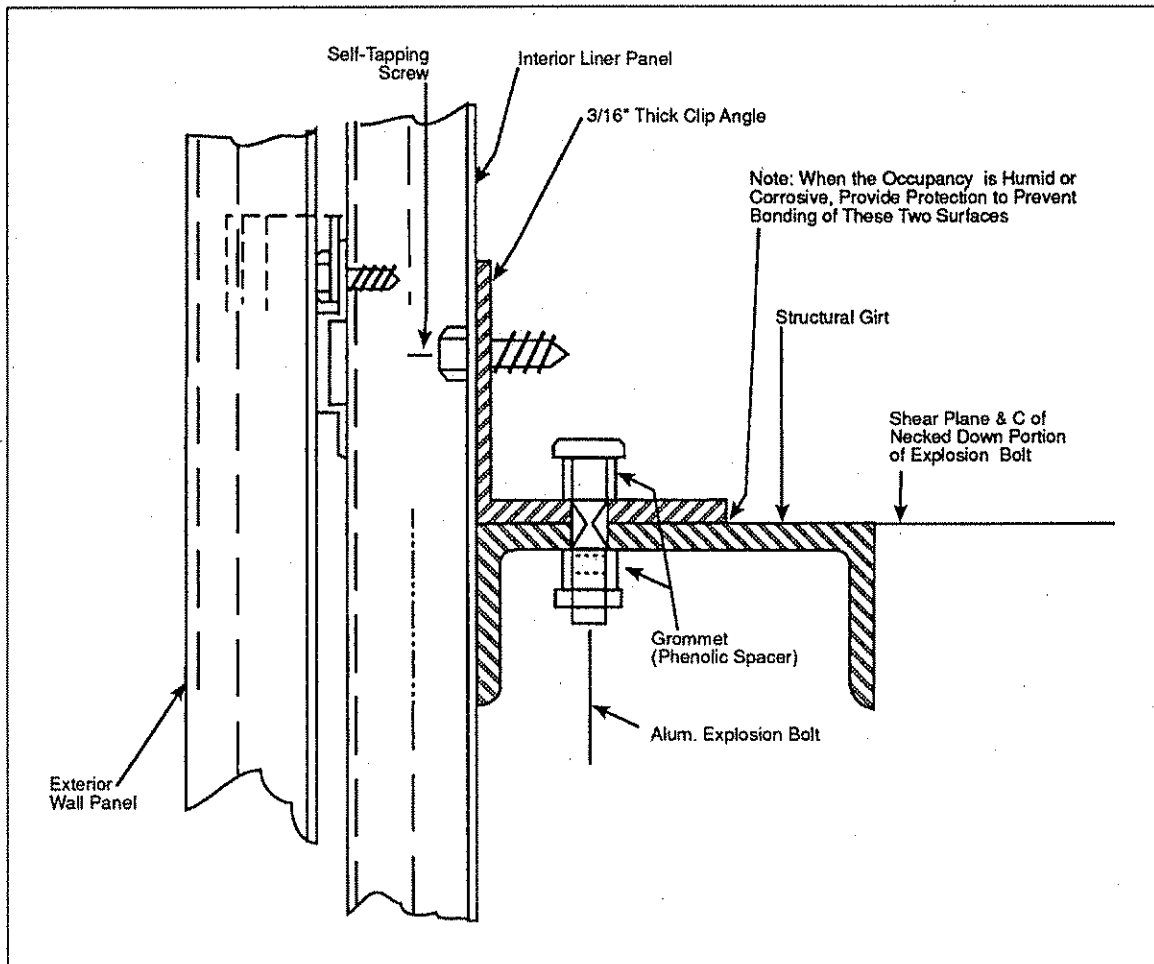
Reduced-shank machine bolt installed to fail in shear.
